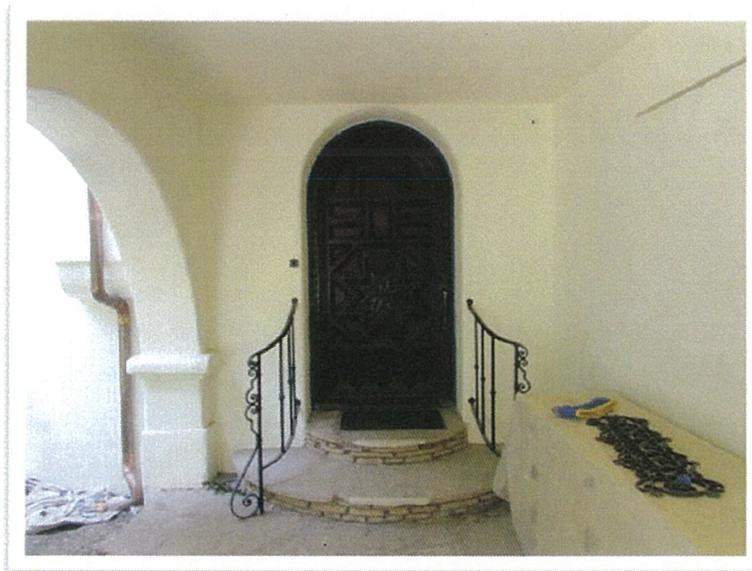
Front entry door detail set within loggia along north wing, looking west
